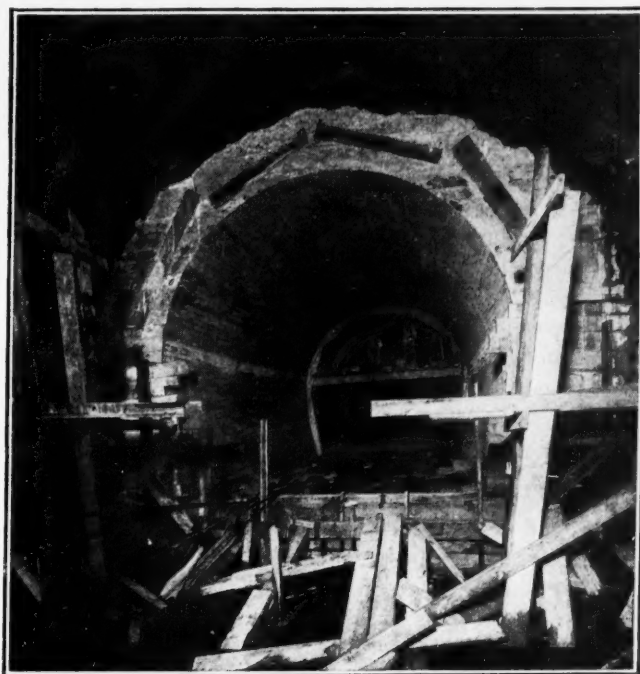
END VIEW OF CONCRETE TUNNEL LINING
